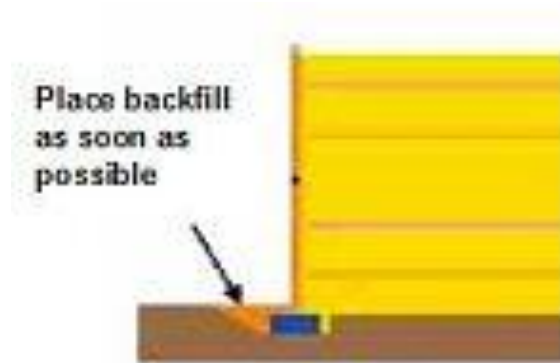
, Place Backfill in Front of the Wall as Soon as Practical
